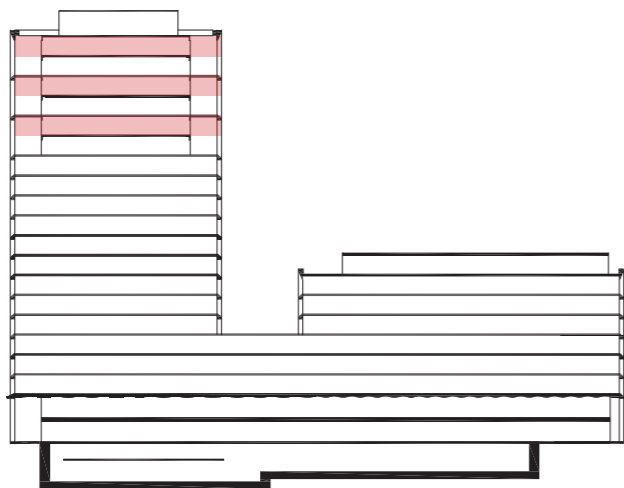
Fifteenth, seventeenth and nineteenth floor plan
